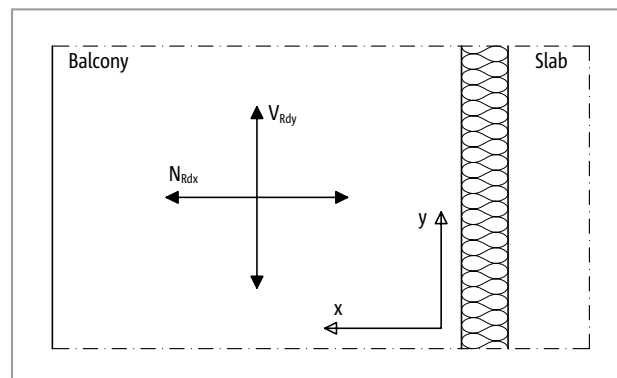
Schöck Isokorb® T type H: Sign convention for the design
